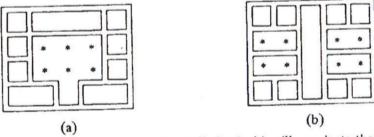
Two plans used by Palladio in his villa projects that fail to satisfy proviso 3. Plan (a) is used in the Villa Cornaro, and plan (b) in the Villa Moncenigo.
